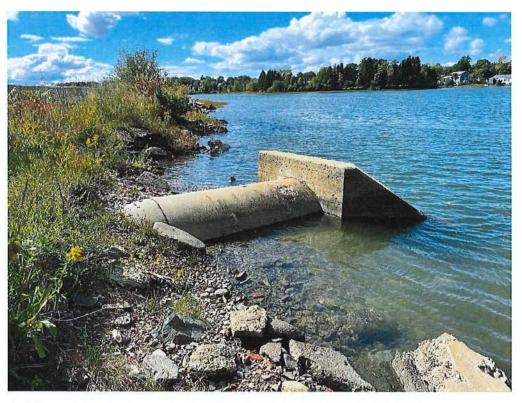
Existing outfall headwall, exposed 48" RCP pipe, and tidal embankment looking west at high tide. Taken 9/28/22
